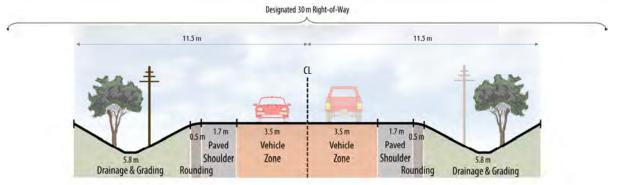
11.4 m Platform Rural Cross-Section for Winston Churchill Boulevard
